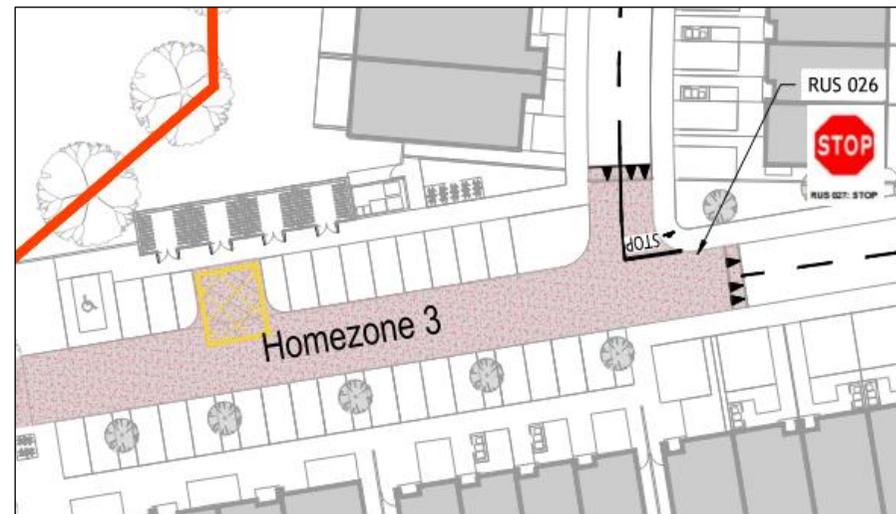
Detail of Perpendicular Parking on Homezone 3 illustrating Perpendicular Parking Types
